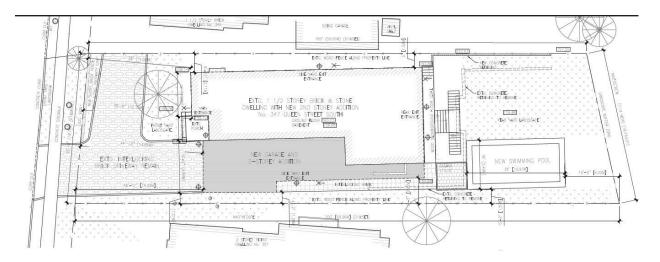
Footprint of proposed development at 347 Queen Street South. (Drawing by client, Jan. 2021.)
